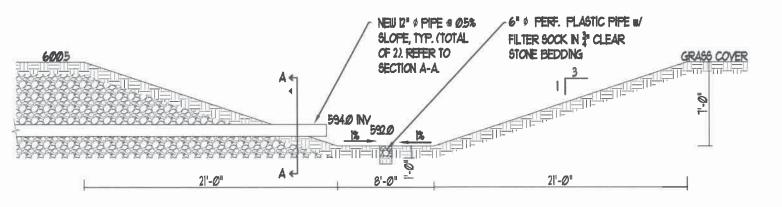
IRRIGATION POND DETAIL SCALE: 1/8" = 1'-0"
